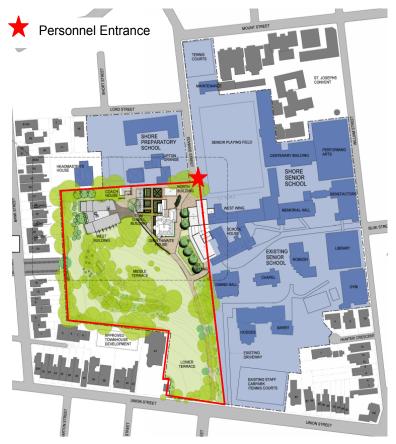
Site Access (Mayoh Plan A.003 Rev G)
